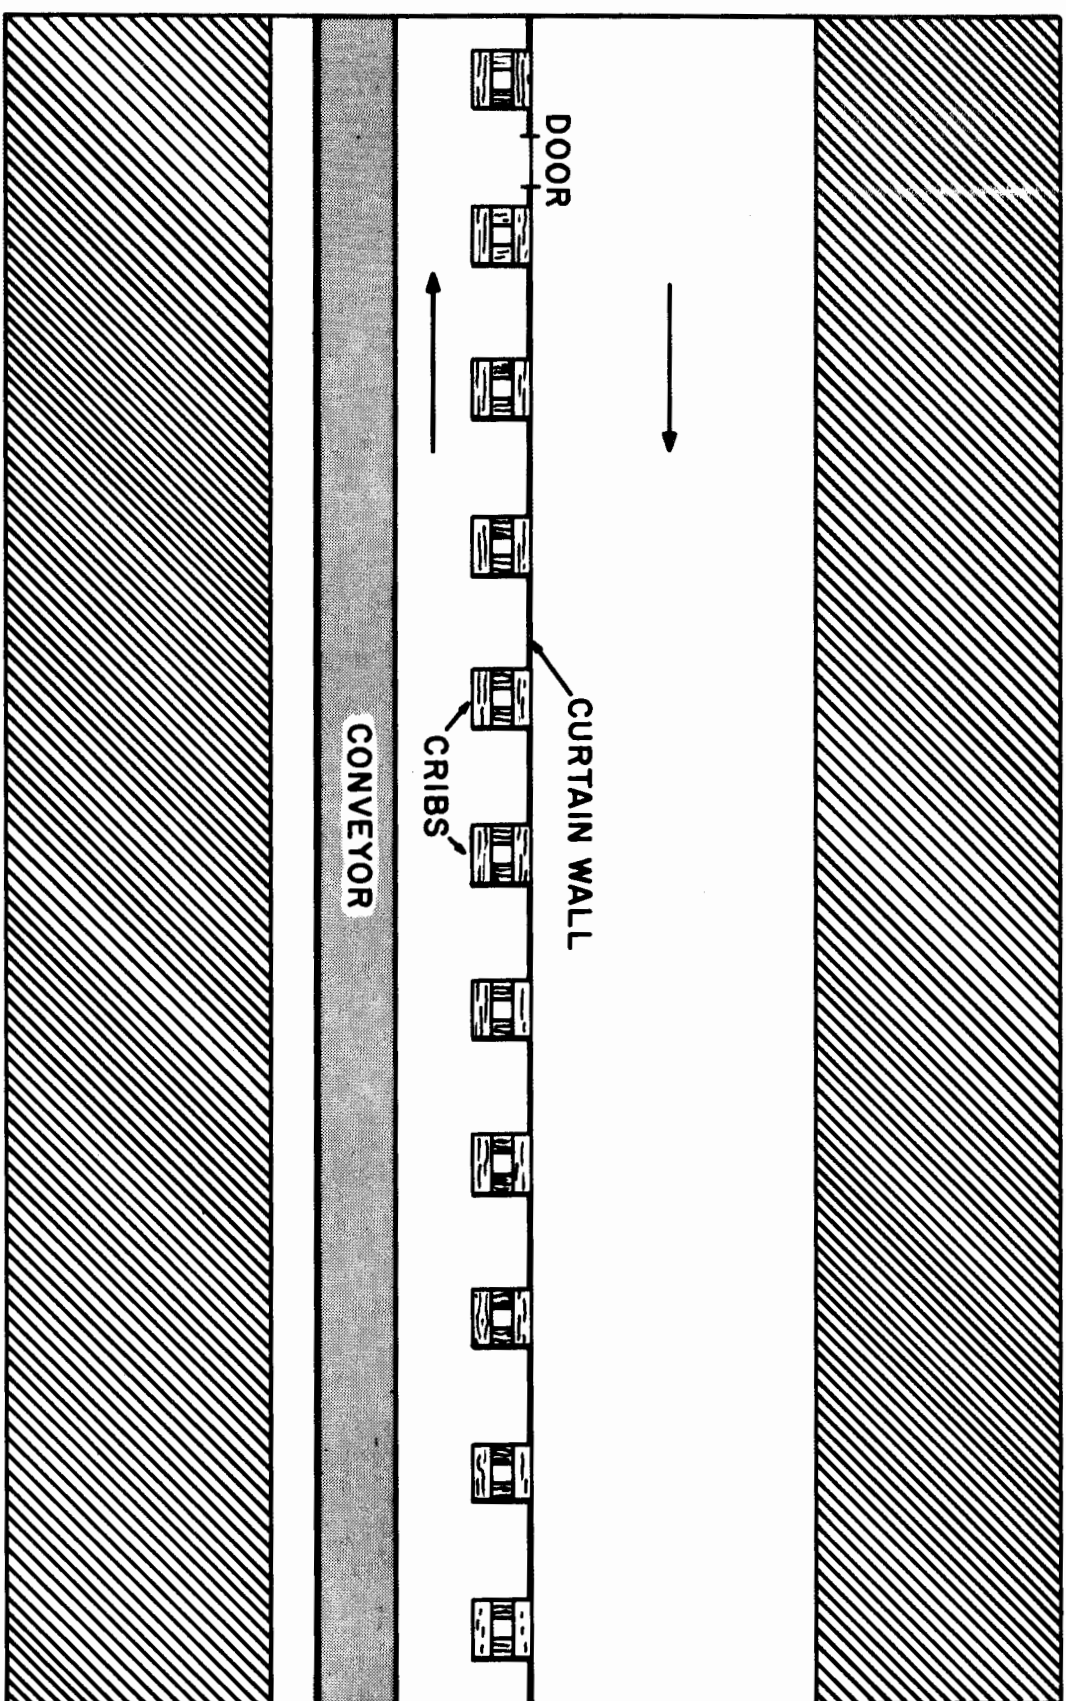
PLAN VIEW OF SINGLE ENTRY DEVELOPMENT, METHOD B
